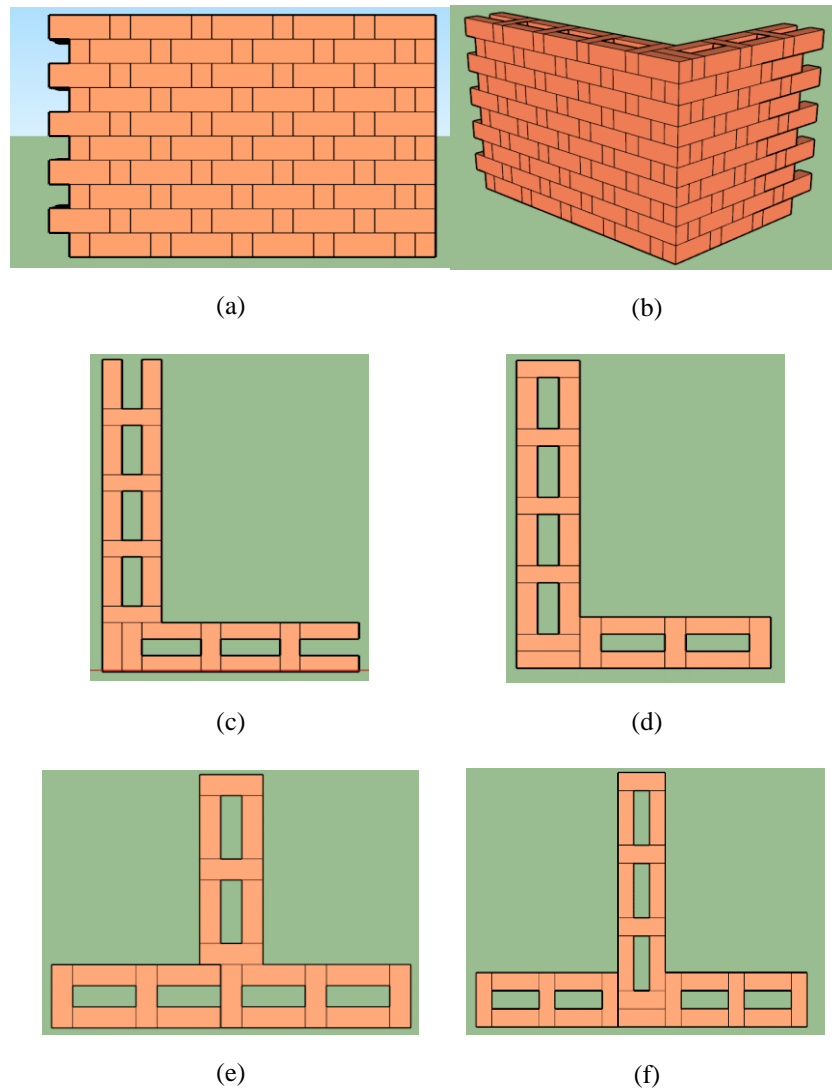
Construction details and layouts of RTB (a) front view of RTB wall (b) typical arrangements in RTB (c) L joint in RTB first course and (d) second course (e) T joint in RTB first course and (f) second course
